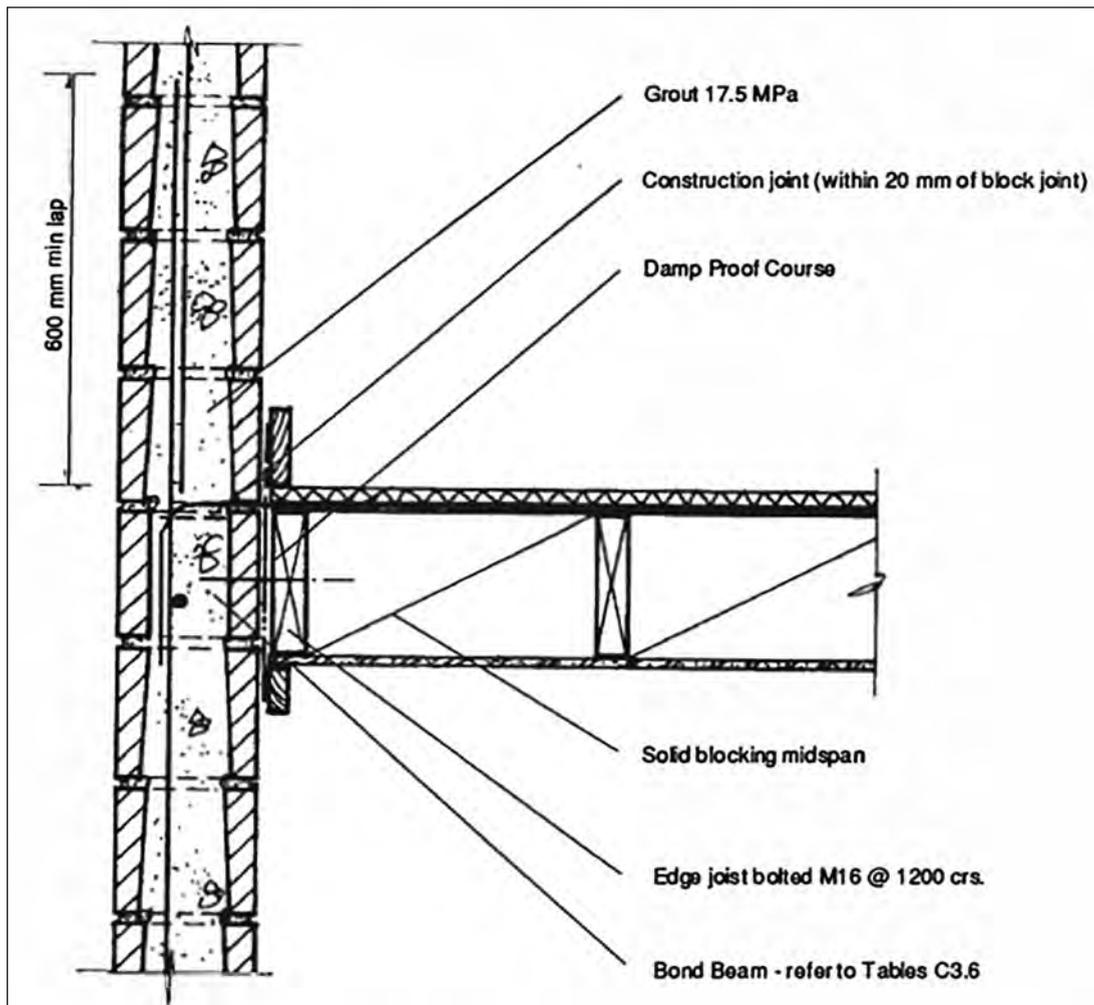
DETAIL OF BOUNDARY JOIST SUPPORT
